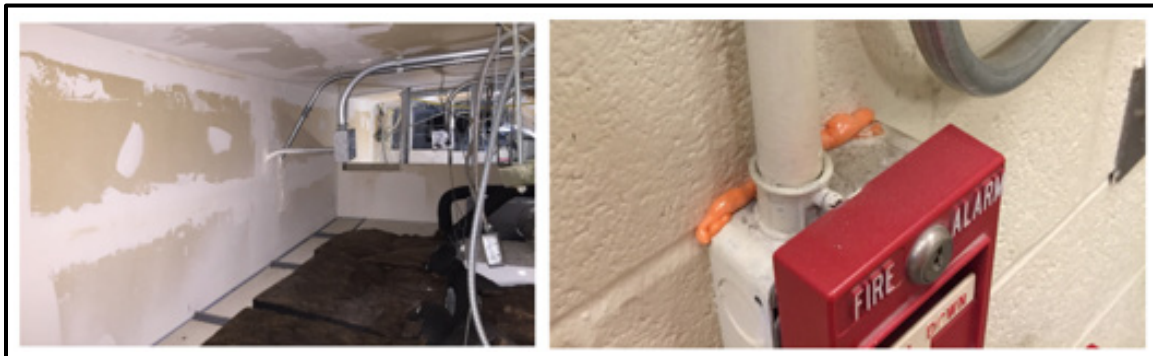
Sealing of leaks around an exhaust fan in the mechanical room.
